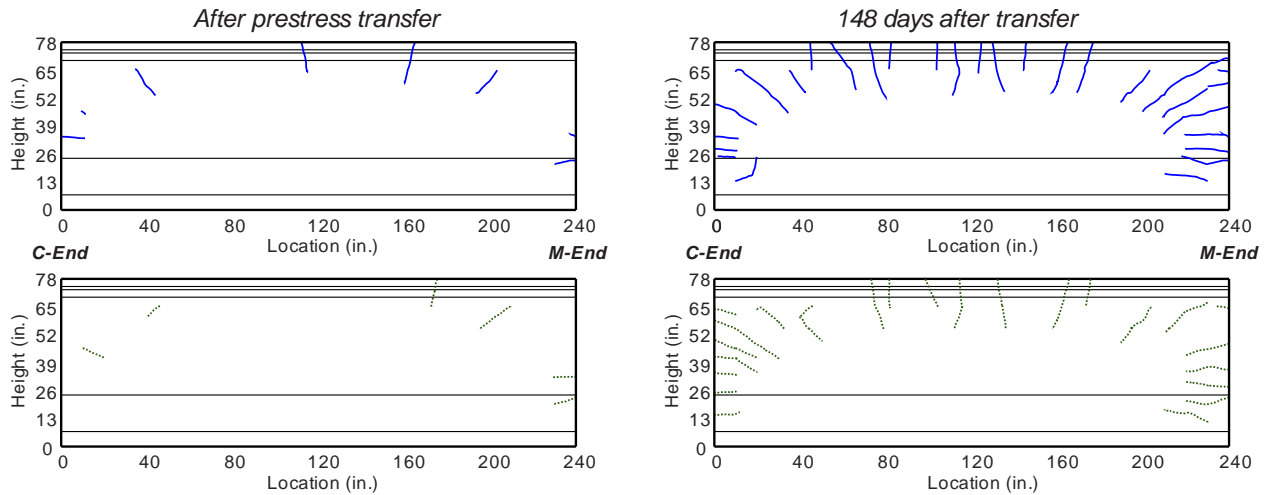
CR-70 Crack patterns shown on North face of specimen. Solid blue lines depict cracks visible on the North face and dashed green lines depict cracks visible on the South face.
